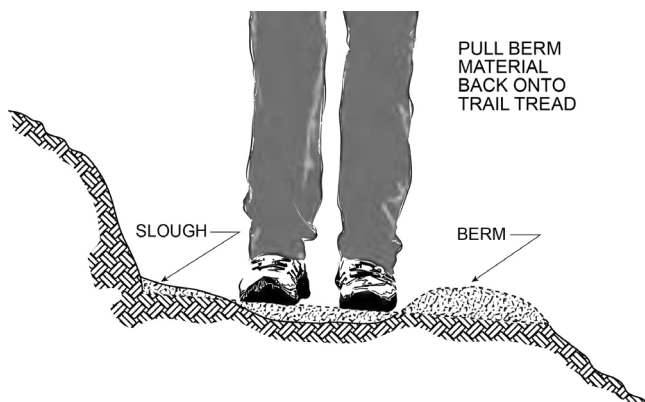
Remove the slough and berm, leaving the trail outsloped so water will run off.
